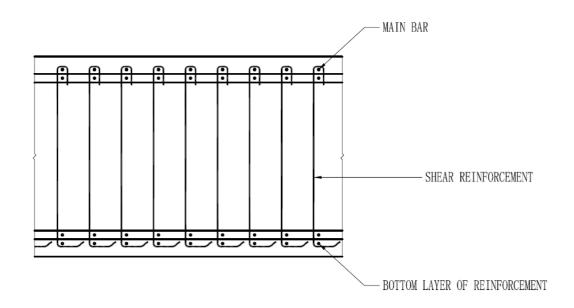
Shear reinforcement hooked to bottom layer of longitudinal bars to be avoided
